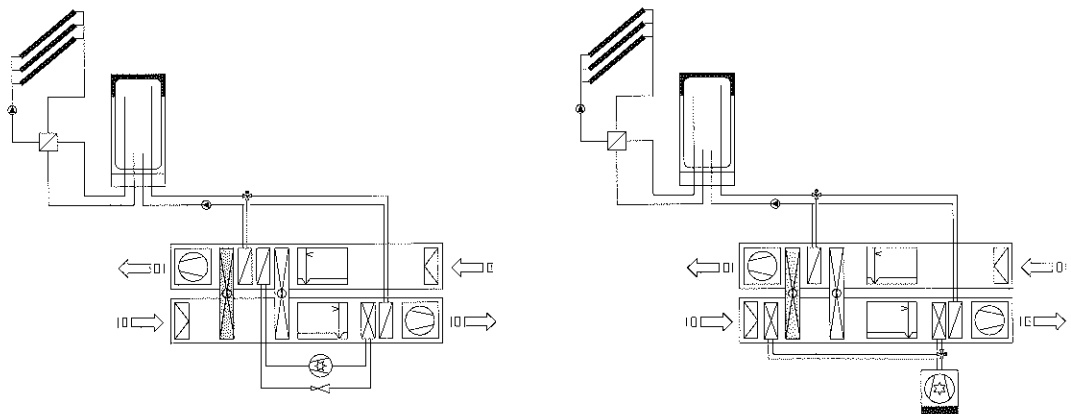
8 Solar-assisted desiccant cooling system including collectors with liquid heat-transfer medium and back-up chiller. Two configurations are shown: left: chiller as an integrated heat pump; right: chiller cooled by ambient air
